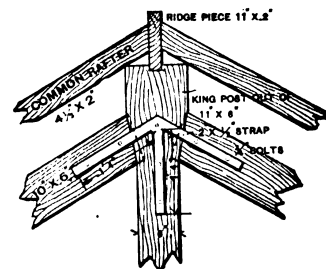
Detail of Joint at A of Fig. 1.—Scale, ¾ Inch to the Foot.
